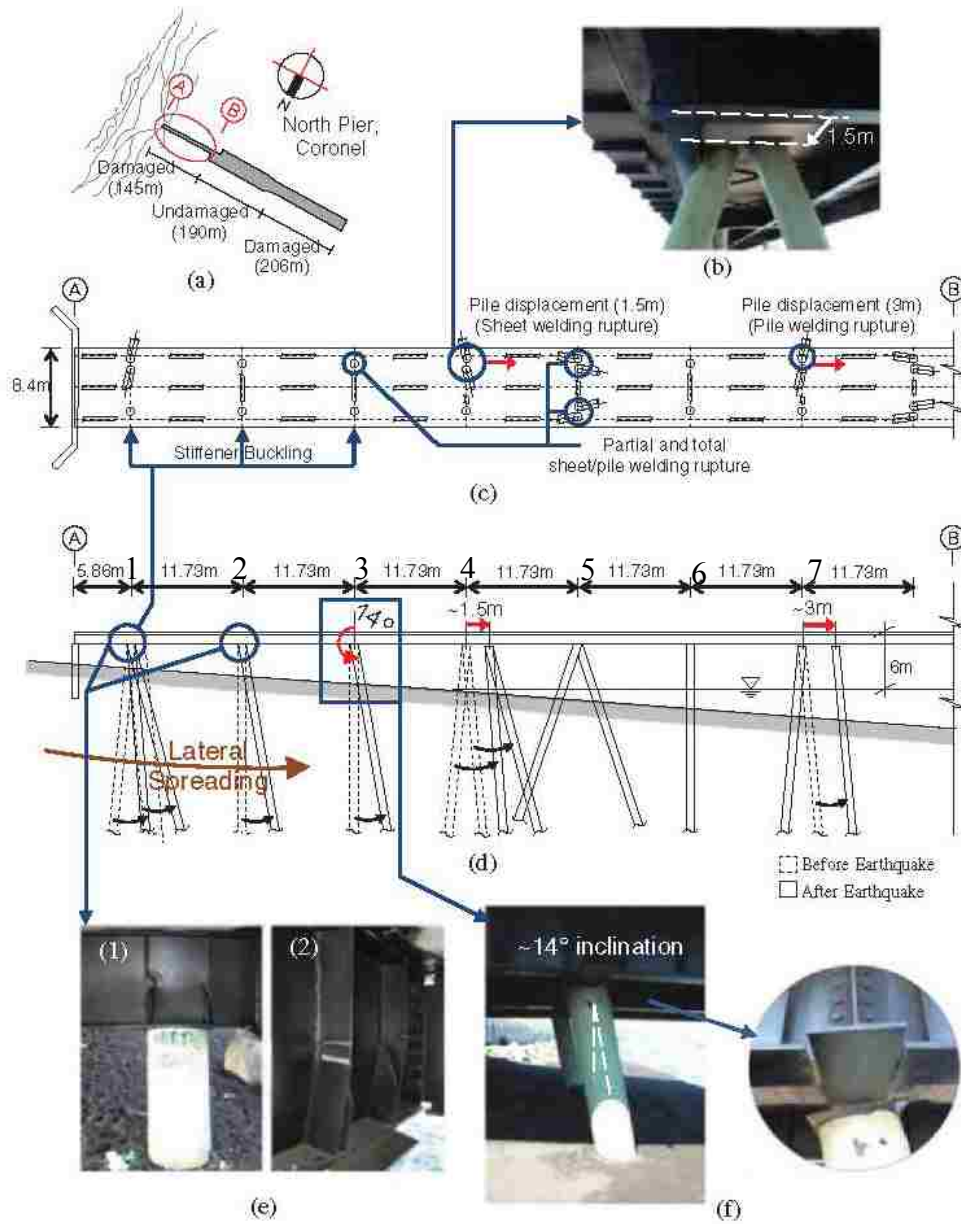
Damage at North Coronel Pier. Modified from (Brunet, et al. 2012)
